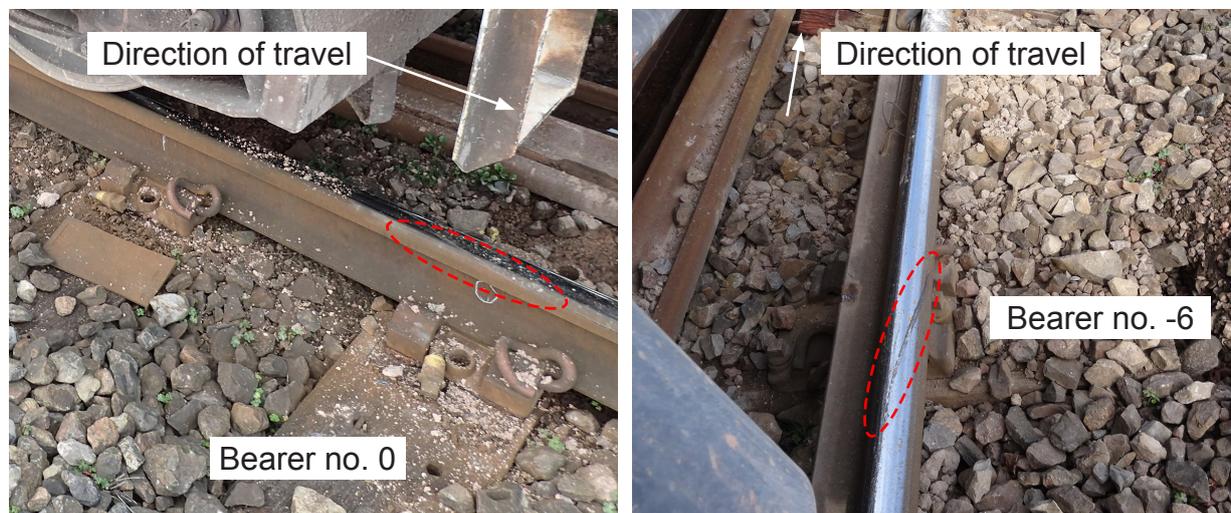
Flange marks on right-hand rail head at bearer nos. 0 and -6
